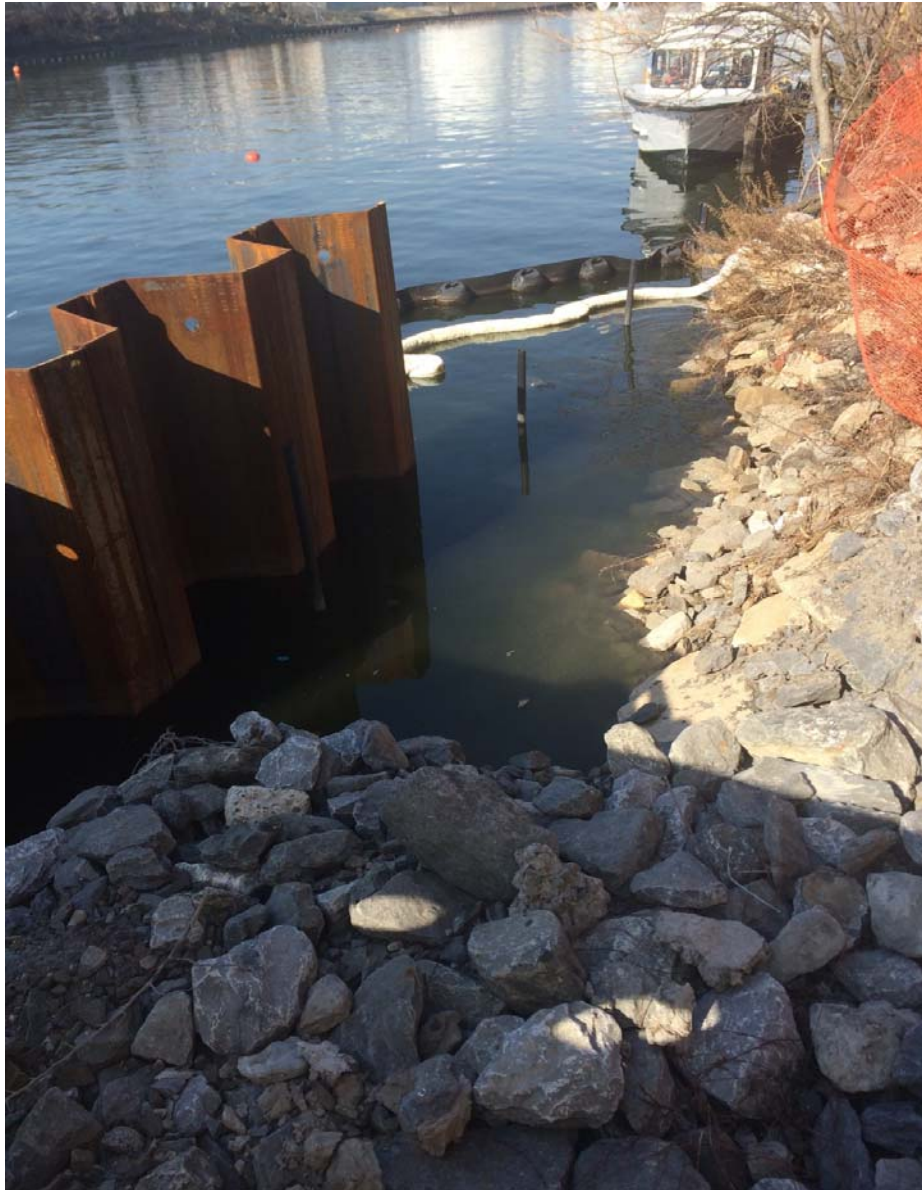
Looking southwest, condition of Newtown Creek during grouting, March 10, 2016
